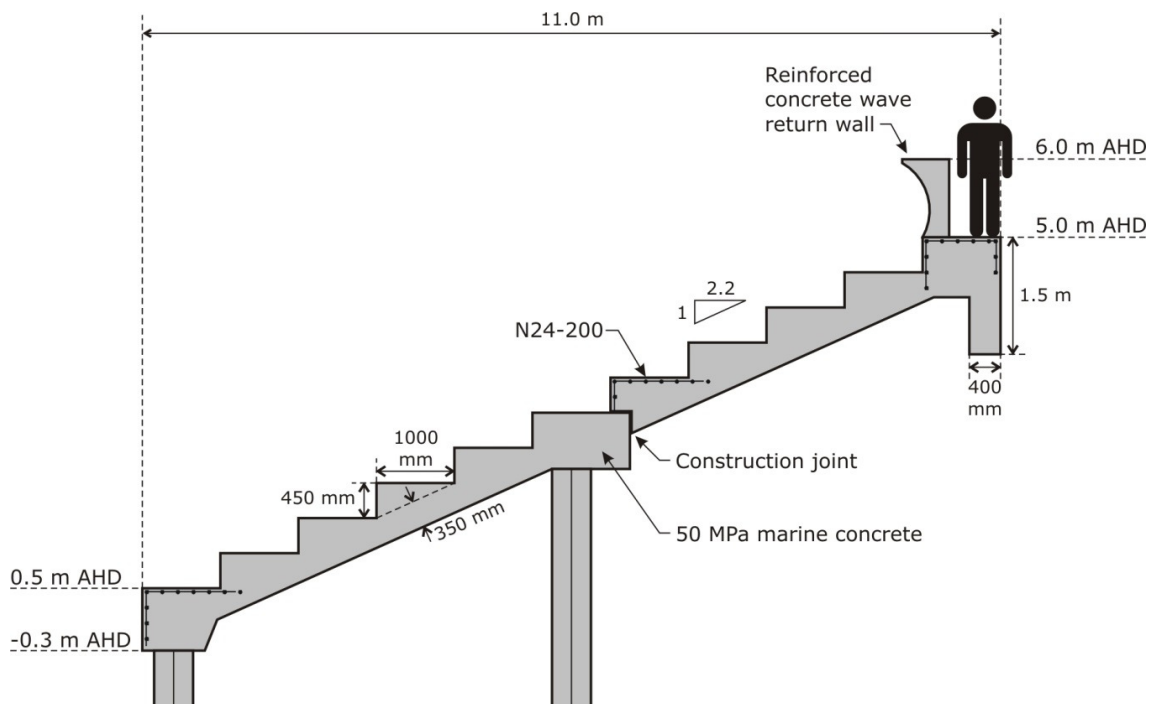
Recommended stepped concrete seawall design for Kingscliff Beach, including 1 m return wall for post-construction adaptation
